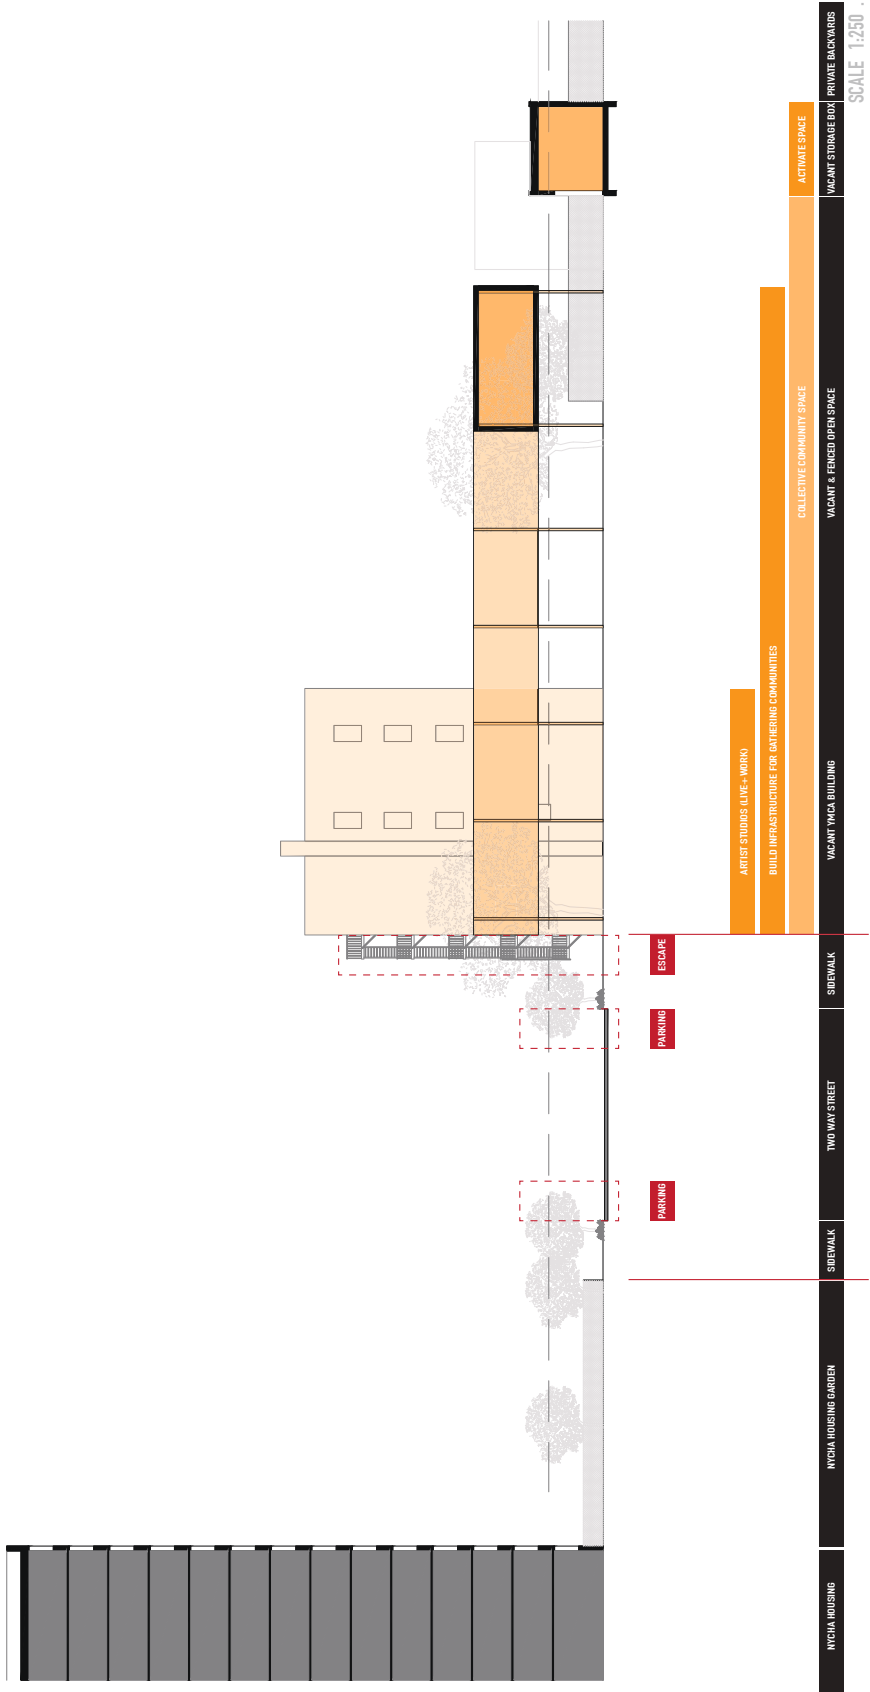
SCENARIO FOR SITE 2 (YMCA-SITE, RICHARDS STREET CENTRAL) IN SCHEMATIC EAST-WEST SECTION
